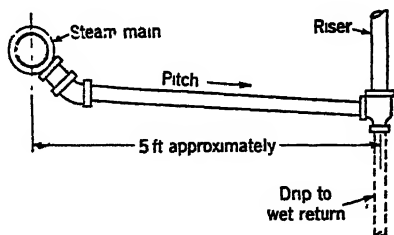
TYPICAL STEAM RUNOUT WHERE RISERS ARE DRIPPED
